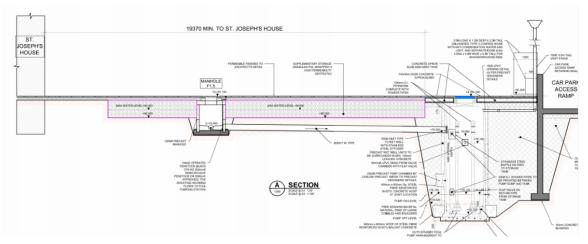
Extract from detail drawings of proposed Waste Water pumping station, prepared by Barrett Mahony Consulting Engineers, showing the minimal visual presence above ground and the distance between the proposed pumping station and the Protected Structure.
